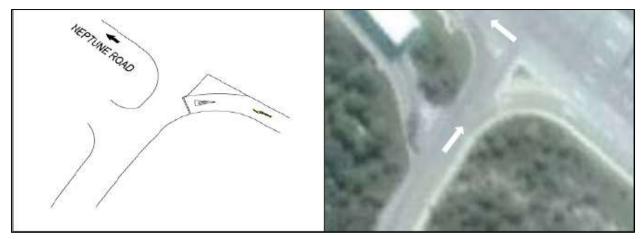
Geometric layout and aerial view of Neptune Road intersection
